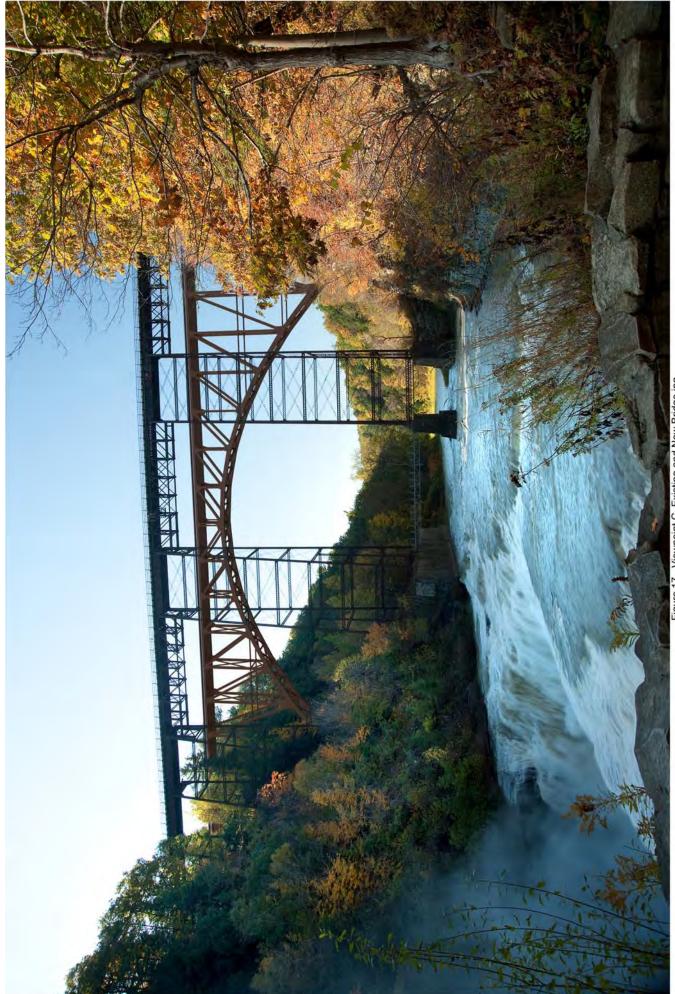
Viewpoint C\_Existing and New Bridge.jpg
